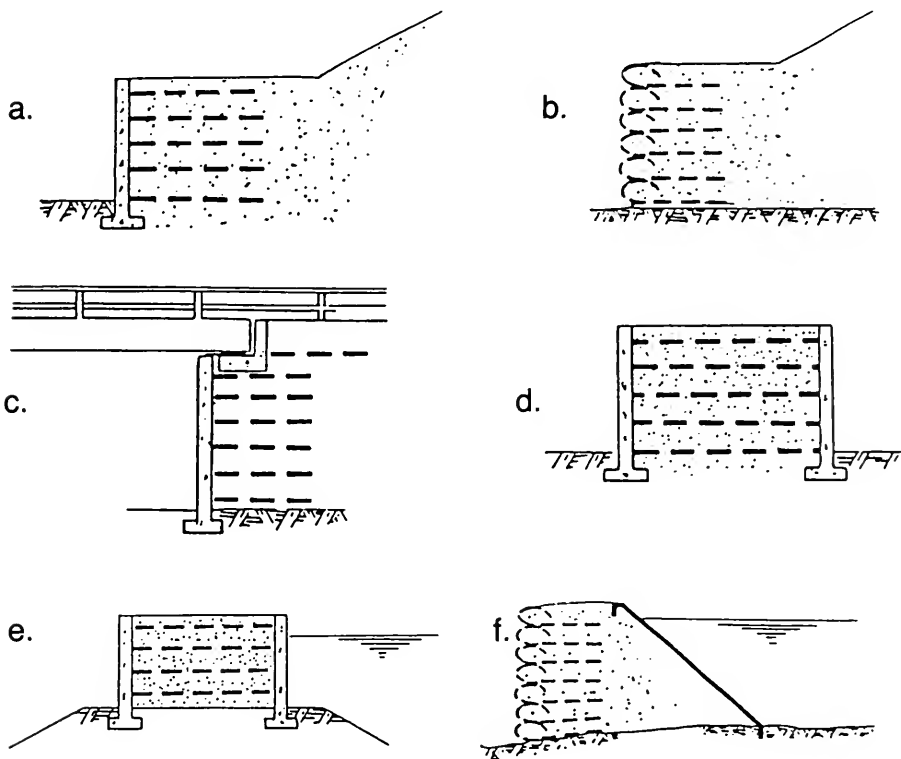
Reinforced Soil Walls: (a) Concrete faced retaining wall; (b) "Wrap-around" faced retaining wall; (c) Bridge abutment; (d) Dike or waterfront structure; (e) Dam extension; and (f) Dam.
